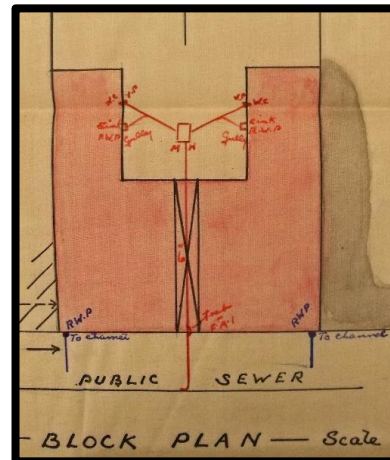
Nos 17 & 19 Madras Road (1903/04) showing connection to sewerage system (CA CB/2/SE/3/9/2122).
